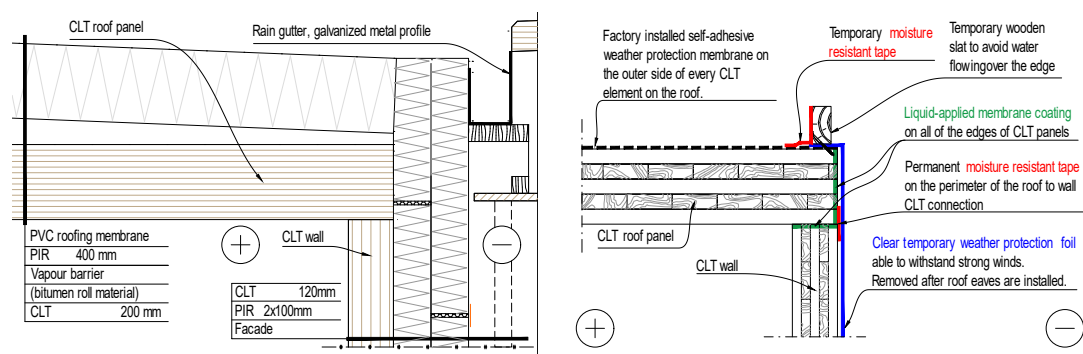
Design drawing (left) of the roof to exterior wall connection and our proposal (right) of wetting mitigation practices.
